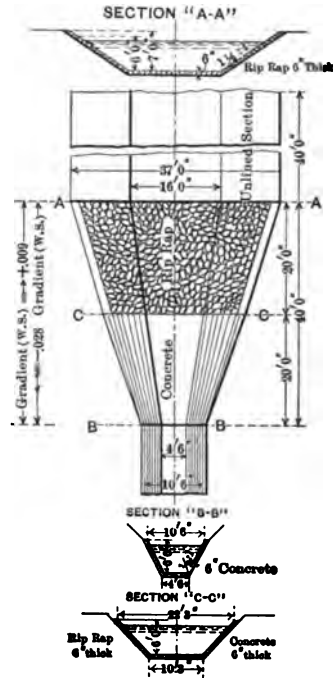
Transition from Rock to Earth Cross-section, Lined Canal, Reclamation Service.
